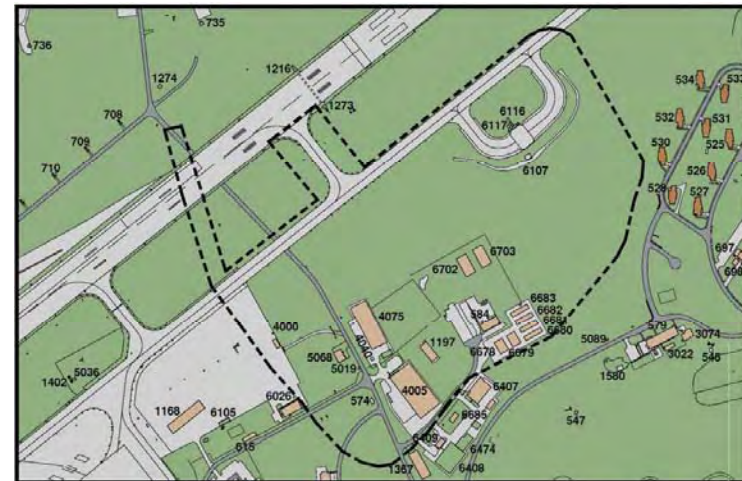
Partial site plan of MCB Hawaii Kaneohe Bay illustrating site C. The facilities within the dashed boundary are proposed for demolition. A MV-22 Aircraft Maintenance Hangar, an aircraft parking apron, a MCAS OPS complex, a new sewer pump station, wash rack, and a POV parking lot. Also, the road will be realigned and a new sentry station will be added.
